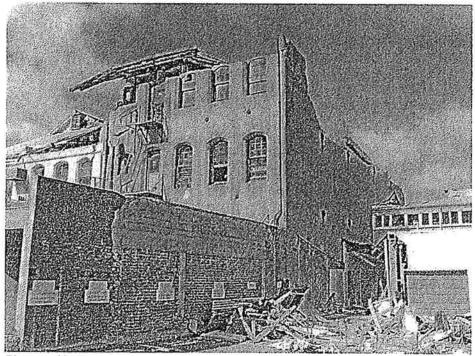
Northwest corner of building showing only remaining 3rd floor walls and roof.
